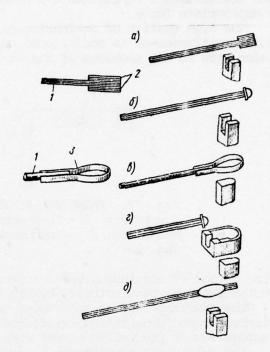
END ANCHORS FOR PRESTRESSED RE-INFORCEMENT.
